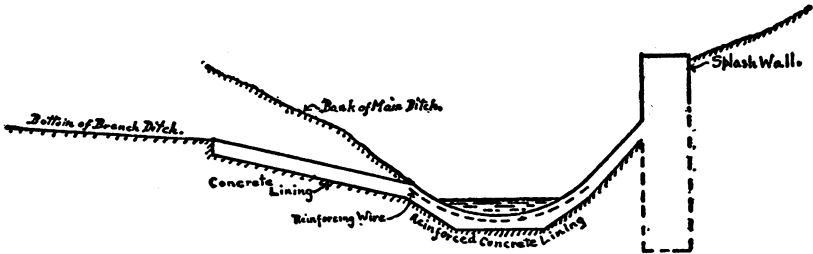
Cross section showing junction of concrete-lined ditch and a branch ditch.
